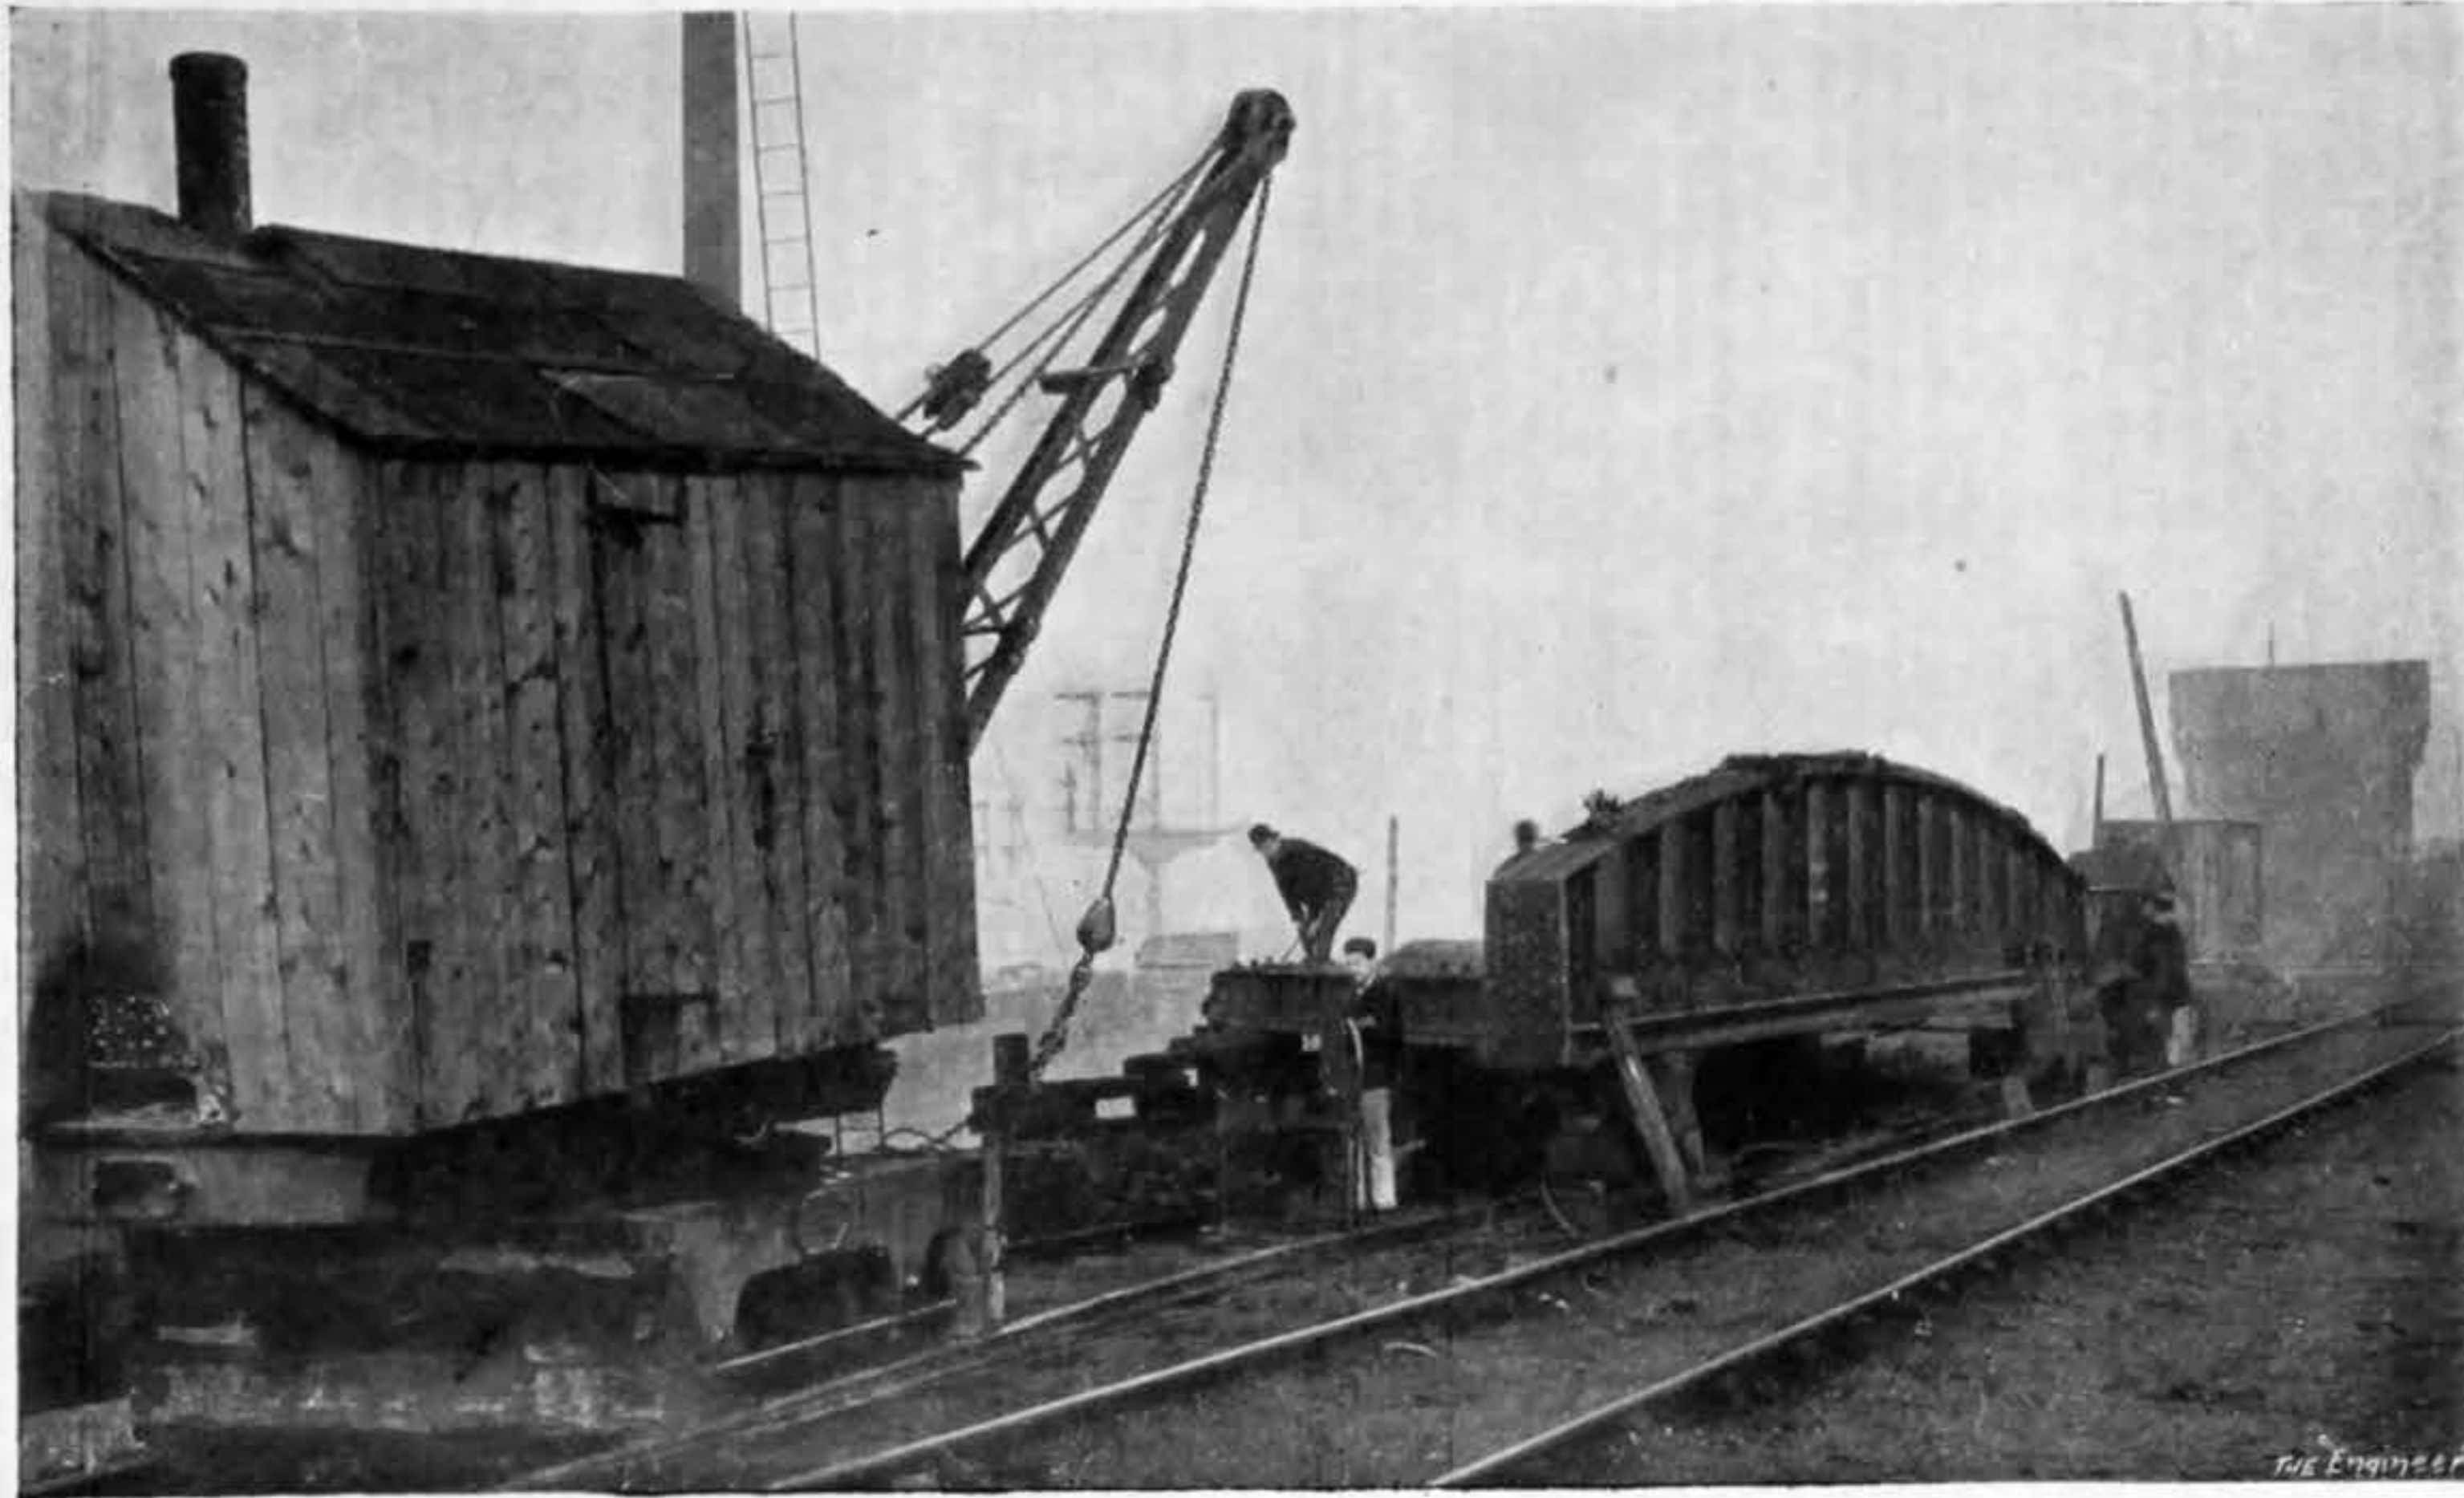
BUILDING SECTION OF BRIDGE BY SIDE OF LINE
